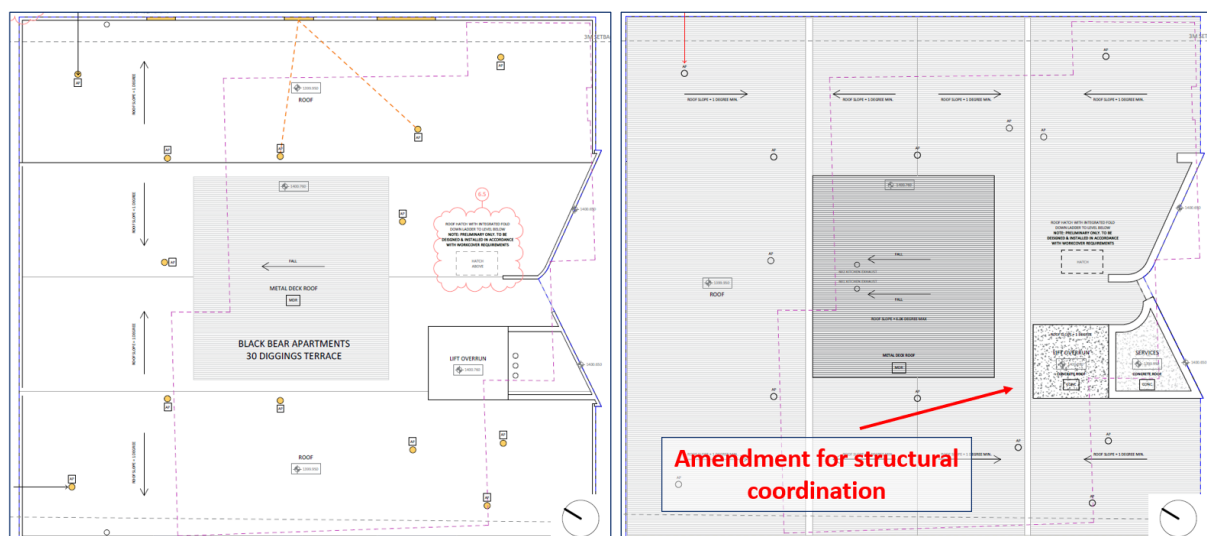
| Approved (left) and proposed (right) Roof plan (Source: Department's Stamped Plans 2022 and Applicant's SEE 2023)
